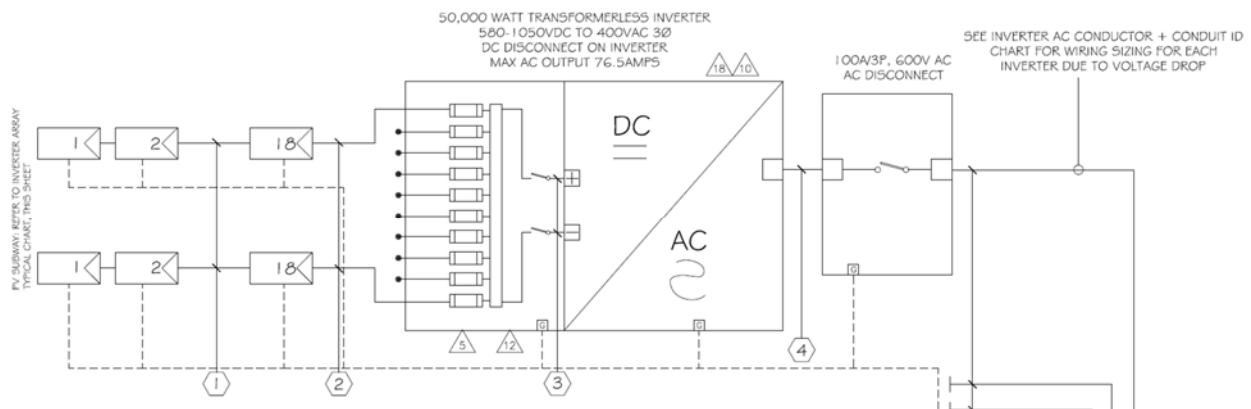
String of 18 PV panels and 10 such strings connected to one PV inverter.
